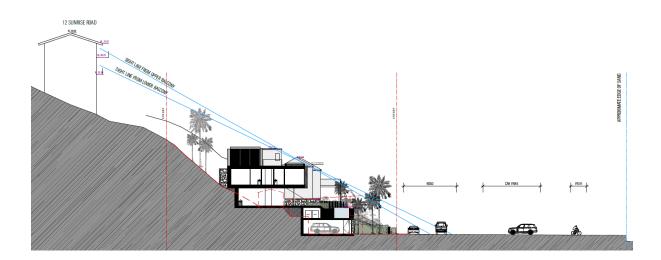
Plan extract DA30(A) demonstrating the maintenance of views available from No. 12 Sunrise Road
